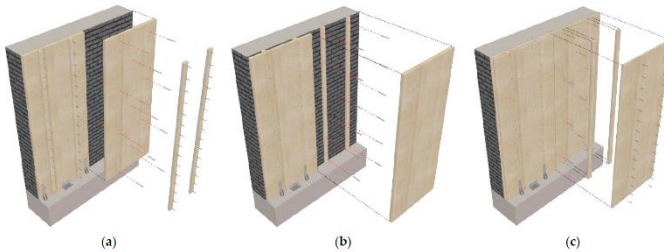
Installation diagram of a strong-back Timber-based hybrid solution: (a) timber panels mounted to the wall and strong-backs applied to the panel surface; (b) strong-backs fixed to the wall and timber panels mounted to the strong-backs; and (c) timber panels linked to the wall and strong-backs and additional panels mounted to the first layer of panels. From [114].
